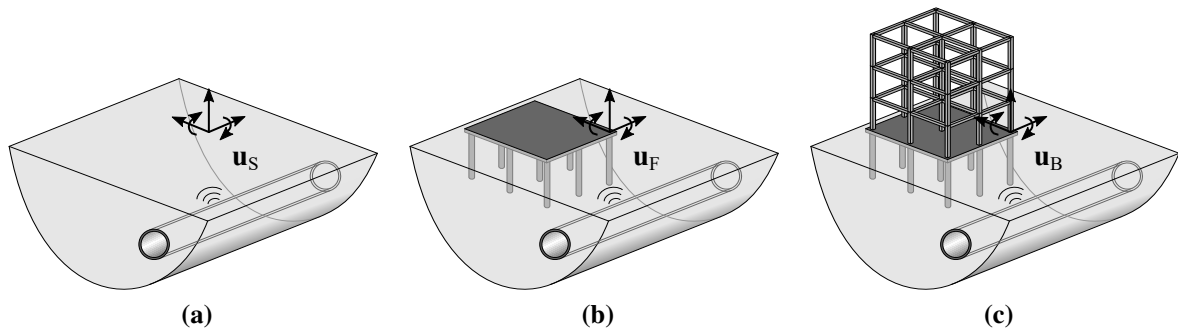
An overview of the ground-borne vibration problem of a tunnel-foundation-building system: (a) greenfield displacement \mathbf{u}_S generated by an underground railway tunnel; (b) displacement wave-field \mathbf{u}_F at the top of the foundation, accounting for tunnel-foundation interaction; and (c) displacement wave-field \mathbf{u}_B at the base of the building, accounting for soil-foundation-building interaction.
